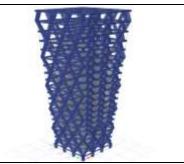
Rendered View of Model 1: G+20 Storied RC Structure with Oblique Columns
